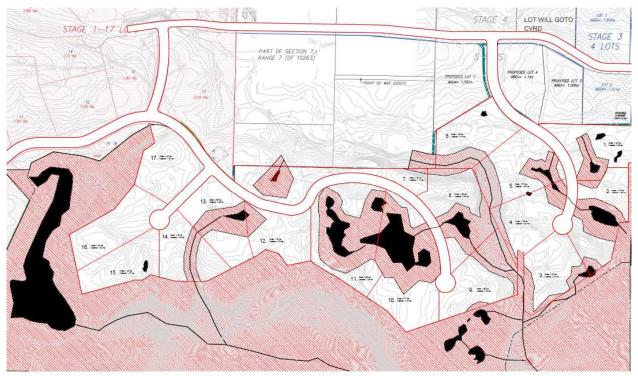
Preliminary Subdivision Plan indicating SPEA
